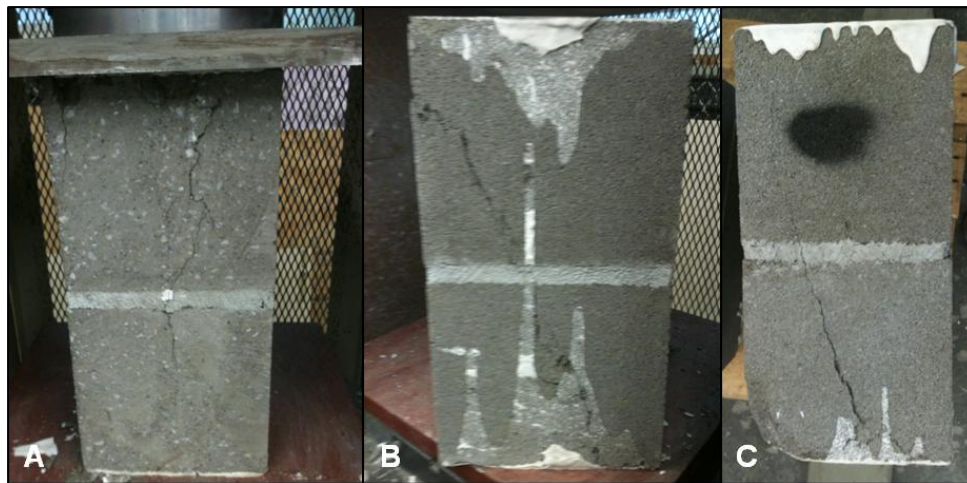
Failure patterns for grouted prisms: (a) face shell separation, (b) face shell separation and shear, (c) shear and crushing
